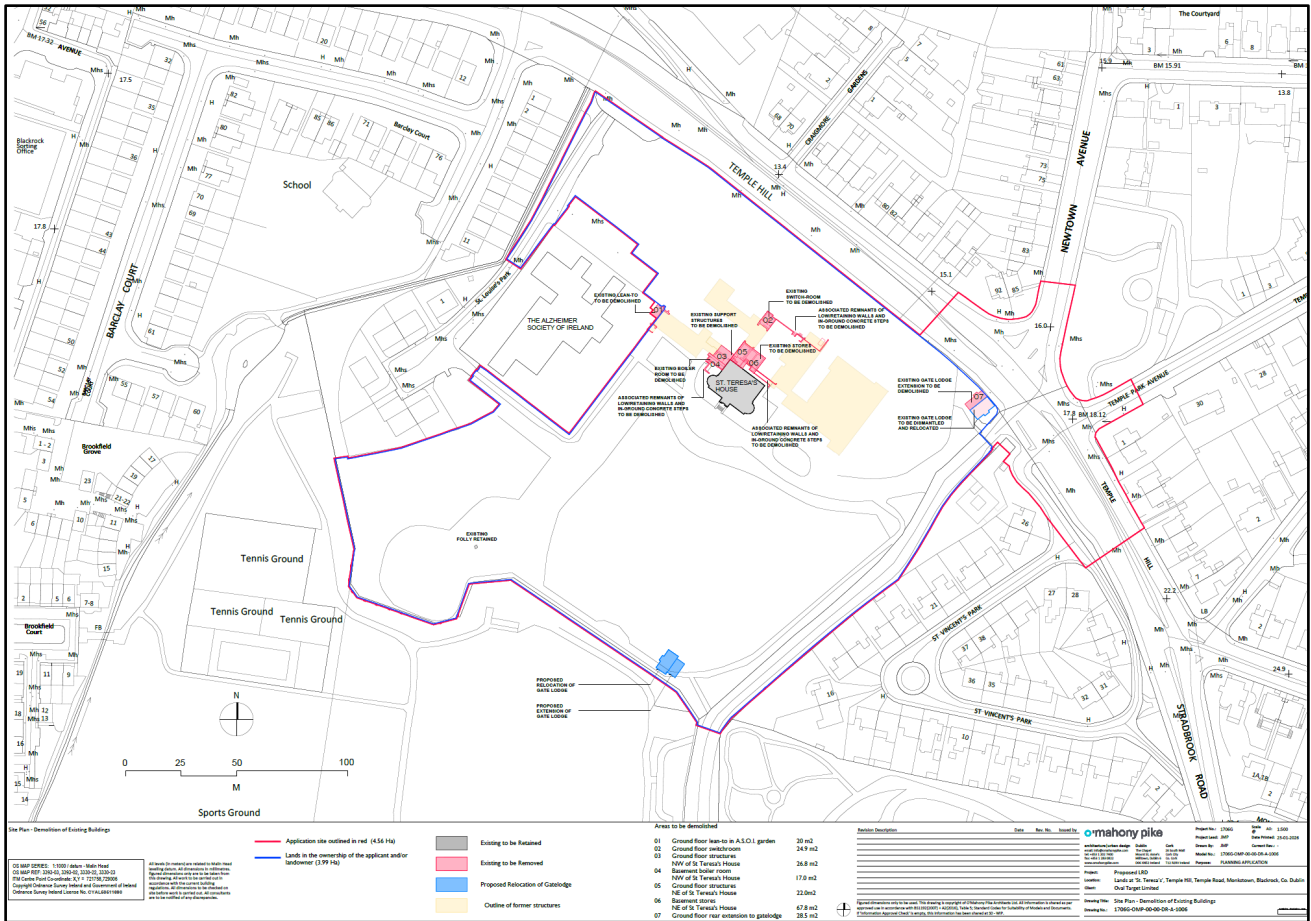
Proposed Demolition Areas (Source O'Mahony Pike 2026)
